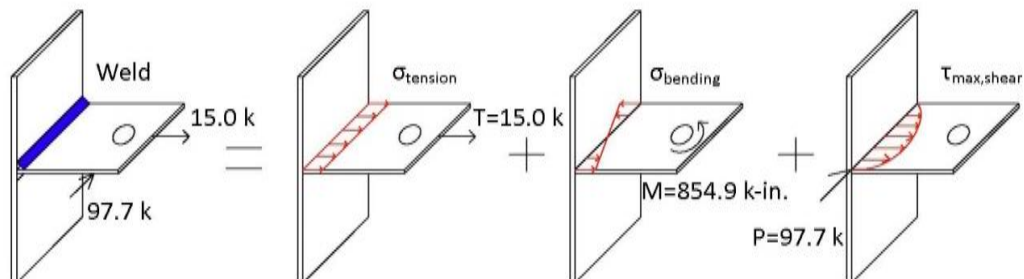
Tension, Bending, and Shear Stresses within Fillet Welds
